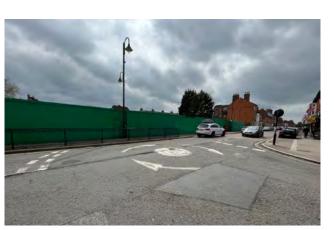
Low quality, well-worn road surfacing and markings at the roundabout of Church Street and Radcliffe Street.
